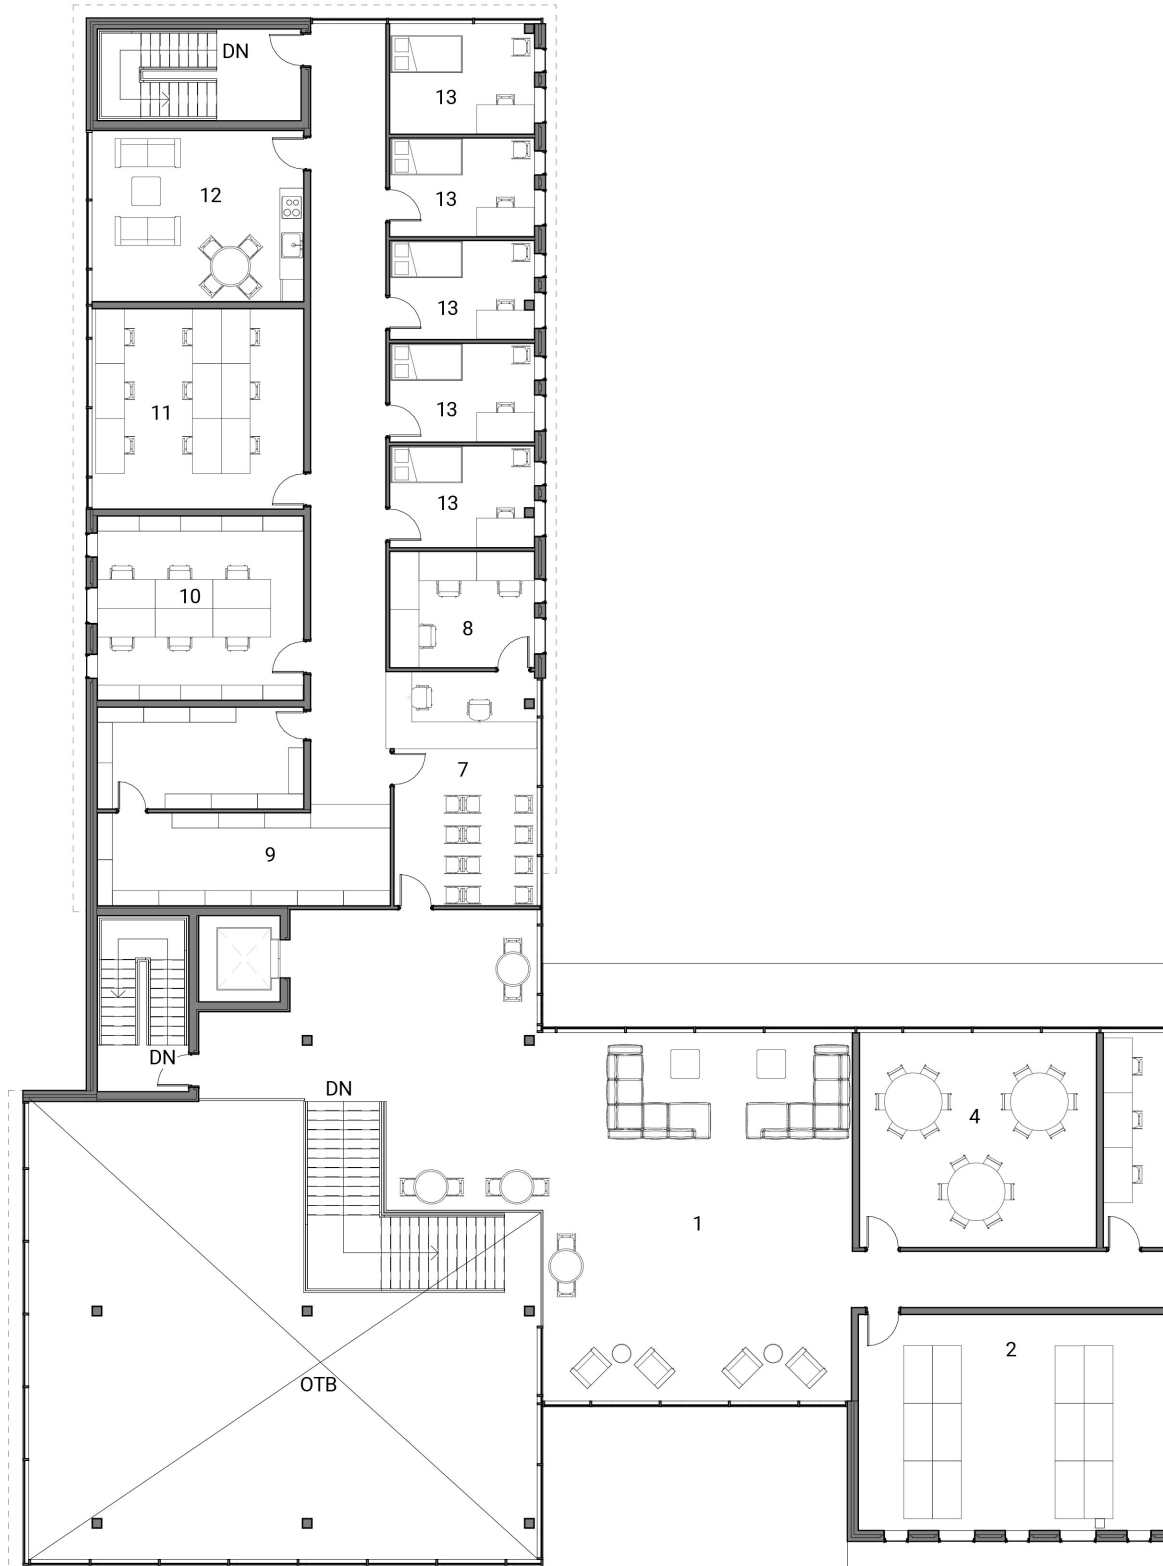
Building A: Community Hub-Ground Floor Plan | Scale: 1:200.
